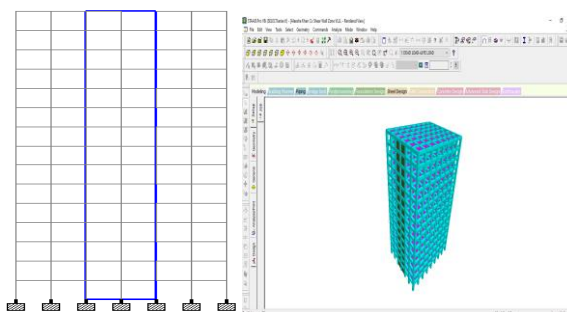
Framed building with Shear wall at the exterior side along X-direction. Zone- III & IV
